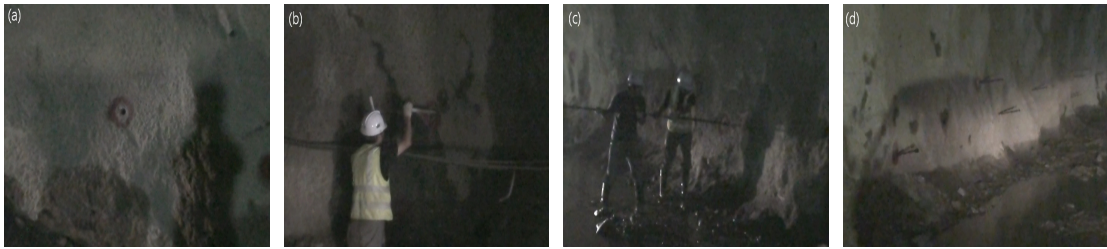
Installation process of spiral bolts and rock bolts in a borehole:
